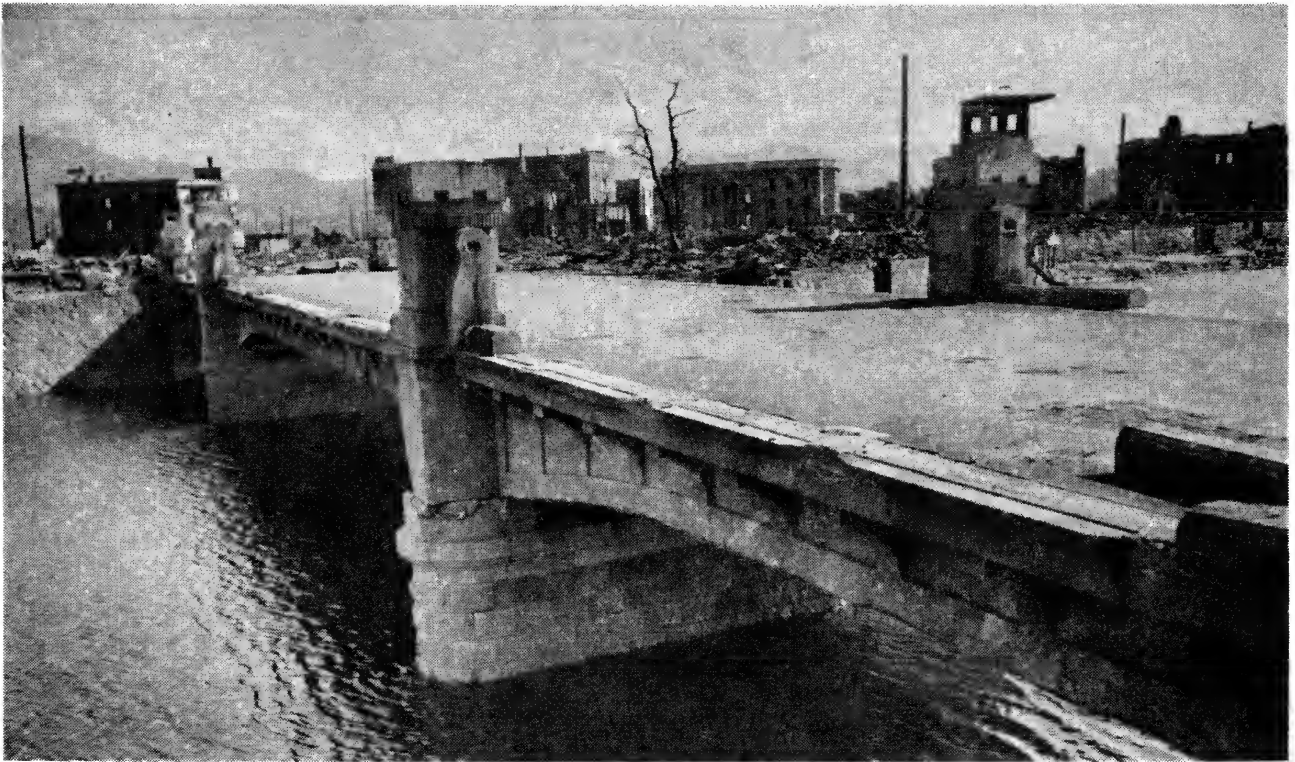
Bridge with deck of reinforced concrete on steel-plate girders: outer girder had concrete facing (270 feet from ground zero at Hiroshima). The railing was blown down but the deck received little damage so that traffic continued.
